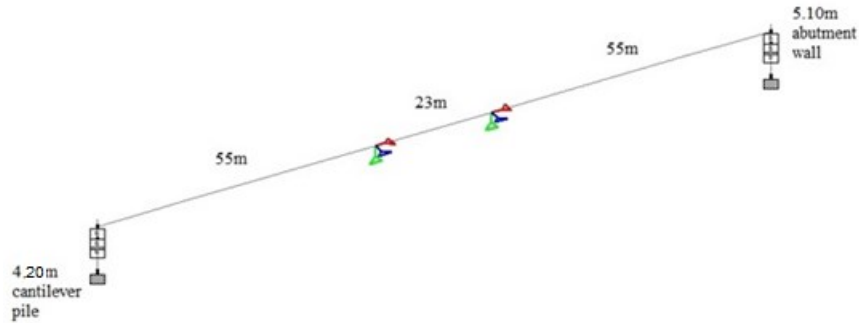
Idealized STAAD 2D Frame Bridge Model (Single Girder).
